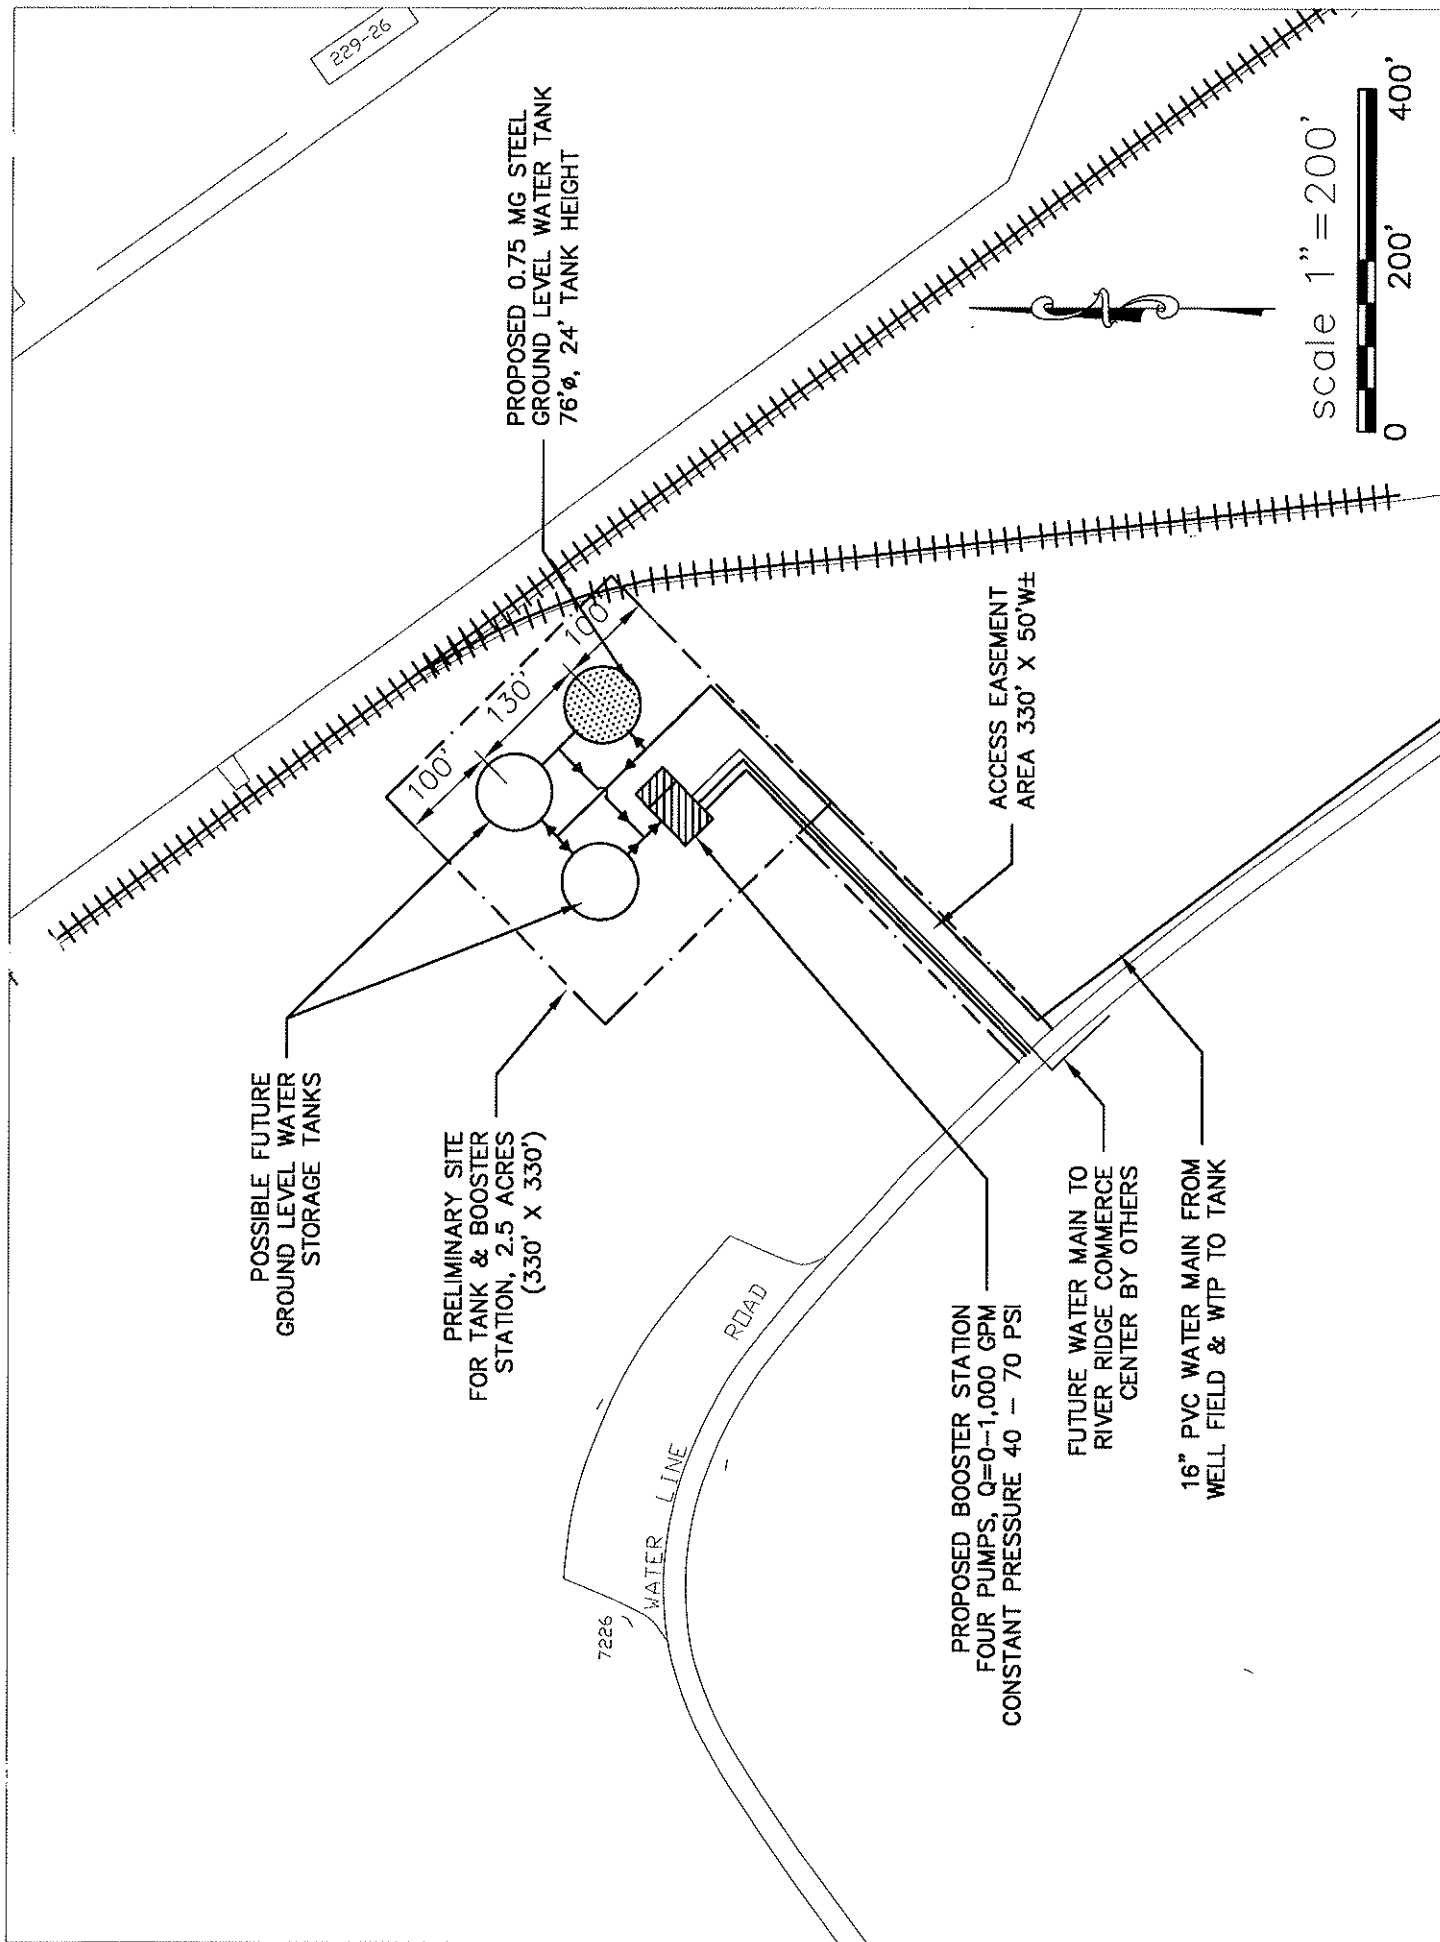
PRELIMINARY SITE PLAN FOR WATER STORAGE TANK & BOOSTER STATION
